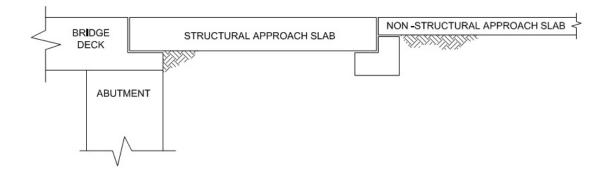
Structural Approach Slab Diagram
